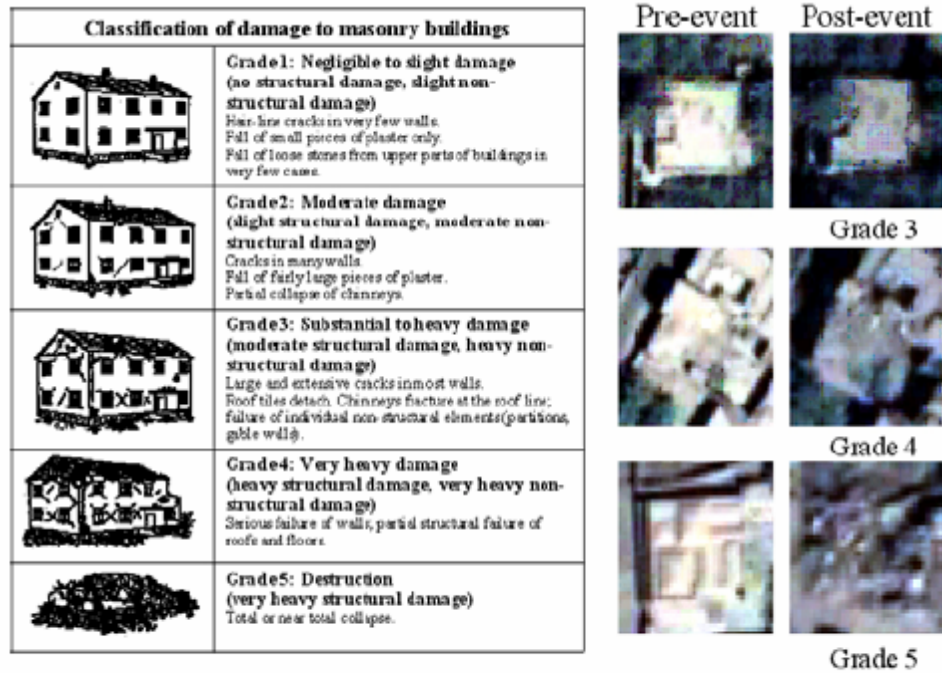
Classification of damage to masonry buildings (EMS 1998) and typical pre- and post event QuickBird images for Grades 3, 4 and 5 houses
